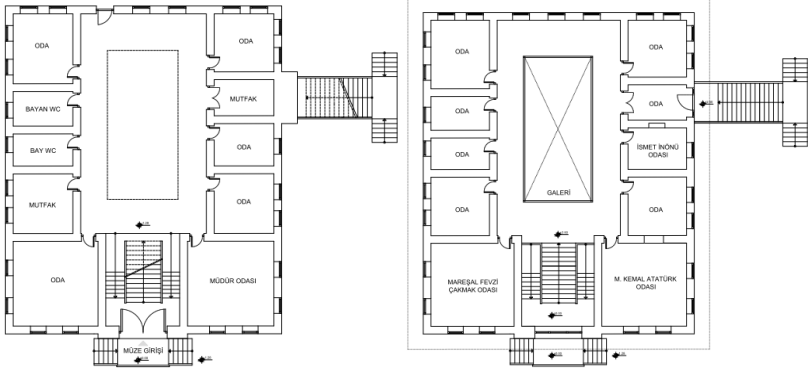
Ground floor plan Figure 4. First floor plan (Created by authors)
